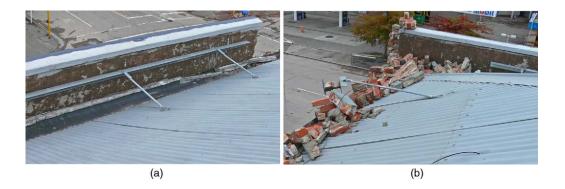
Performance comparison between parapets braced back to a structural element with and without a horizontal steel strip: (a) with a horizontal steel strip; (b) without a horizontal steel strip.
